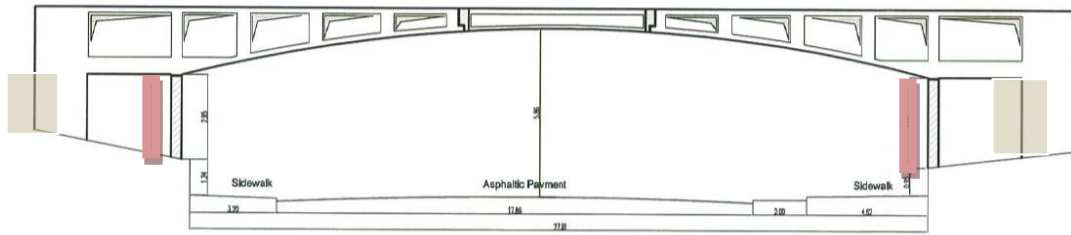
Disposition of exterior (brown) and Abutments of bridge (gray) (section 6-6)
